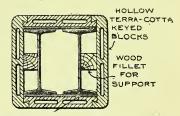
Steel Stanchion protected with Terracotta Blocks.
